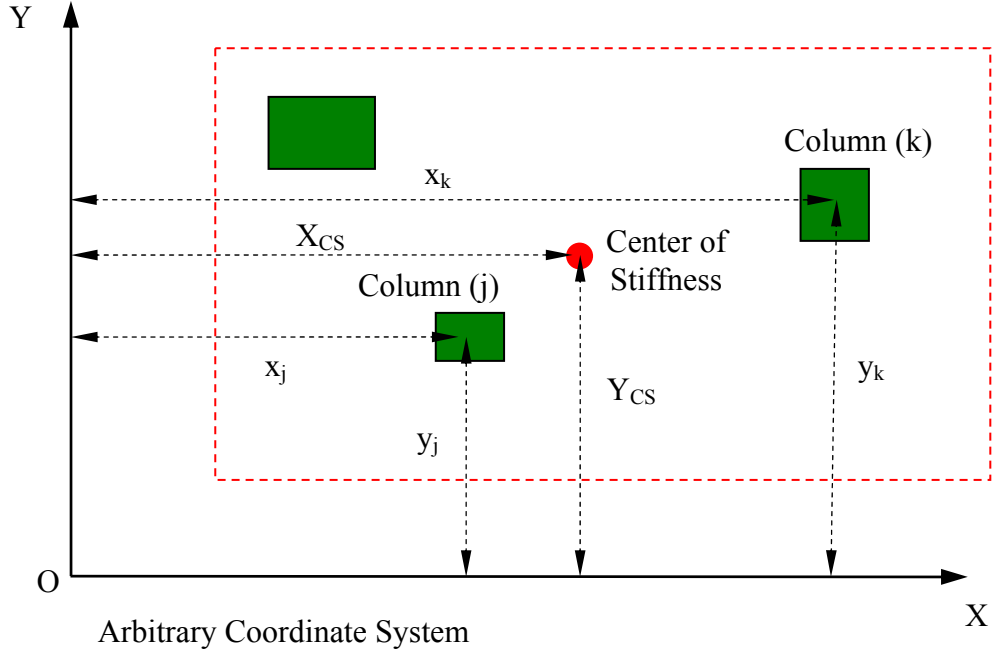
Plan view of story (i) and vertical elements connecting two bases.
